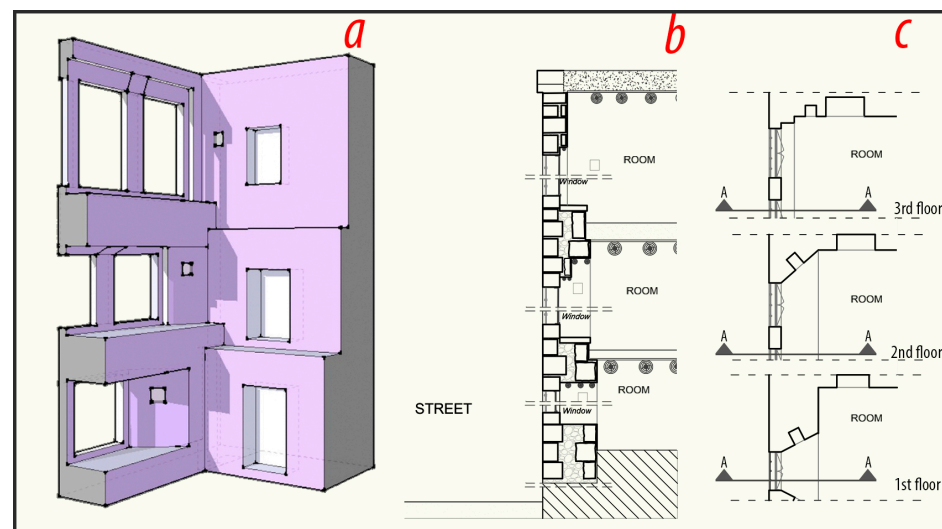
Wall detail: (a) Model of a 3-storey building, (b) Section, (c) Plans.
